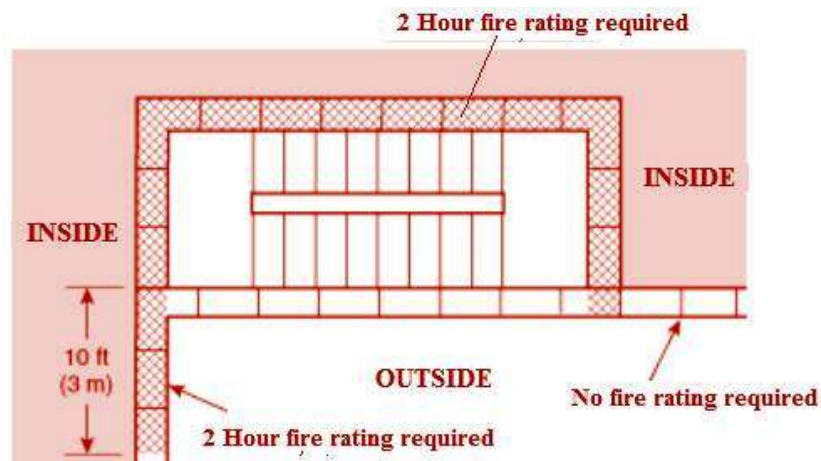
c.: Outside stair with exposed to adjacent building wall
